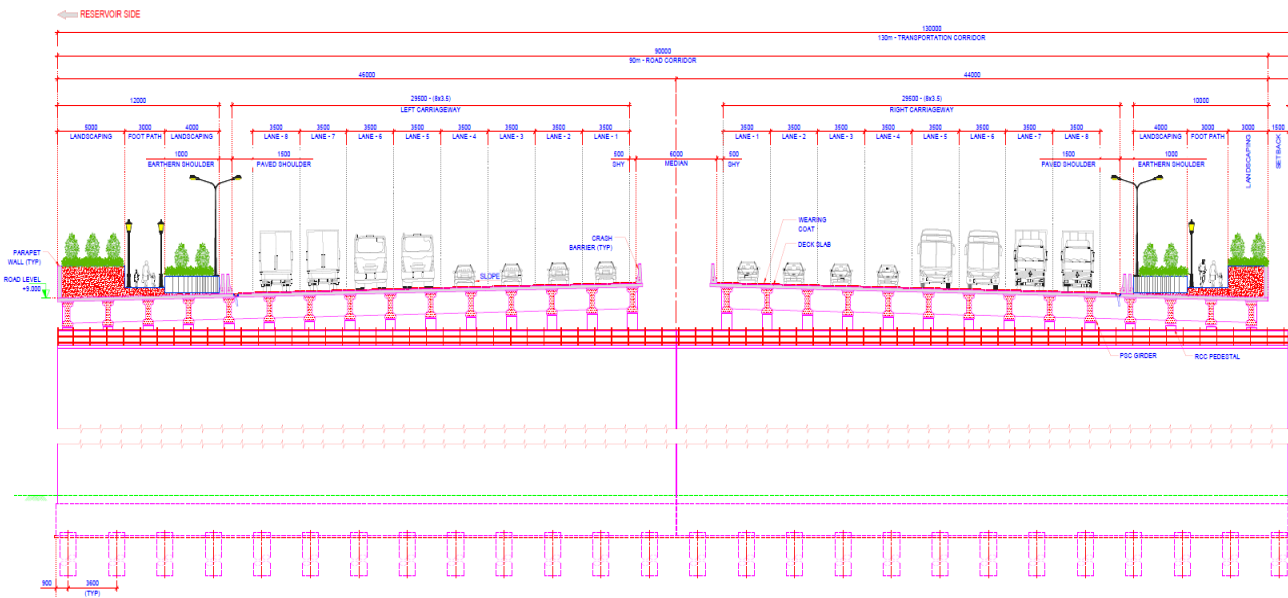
Cross section of road bridge superstructure at Flood regulator
